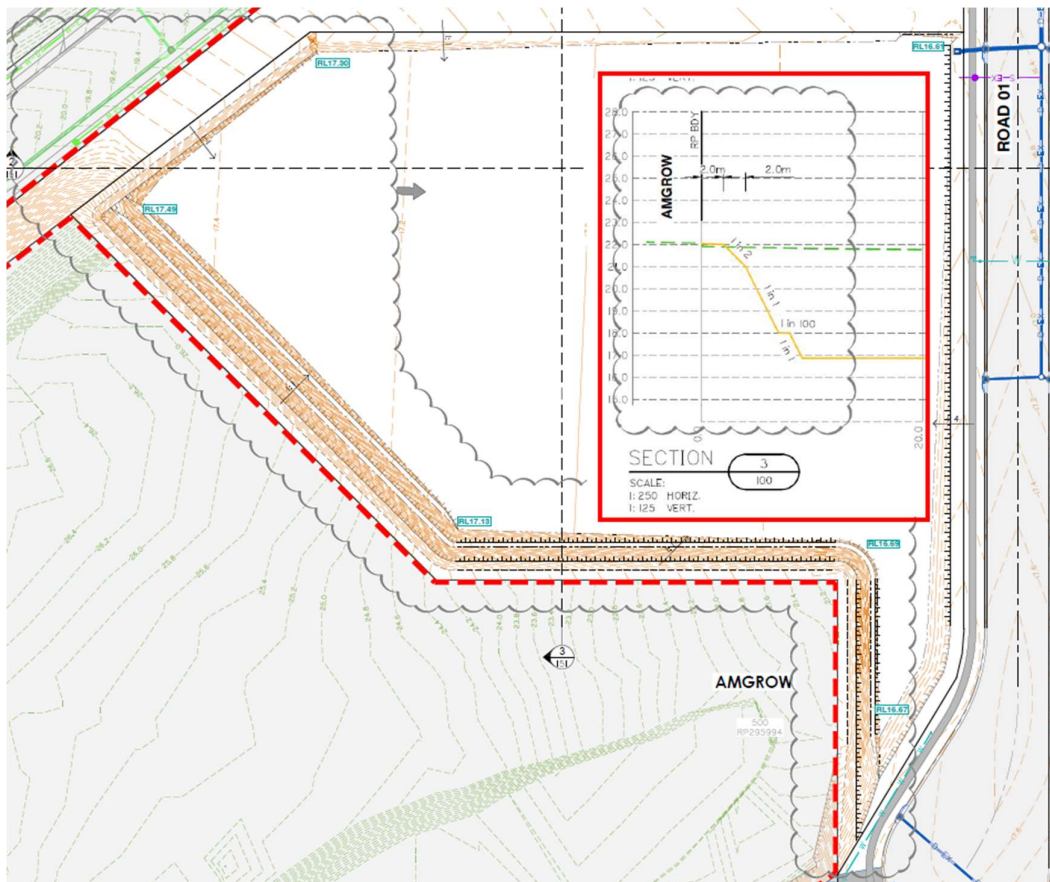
Sections from Approved Bulk Earthwork Plan – COM/2023/82 (OPW - Change to Ground level component)
